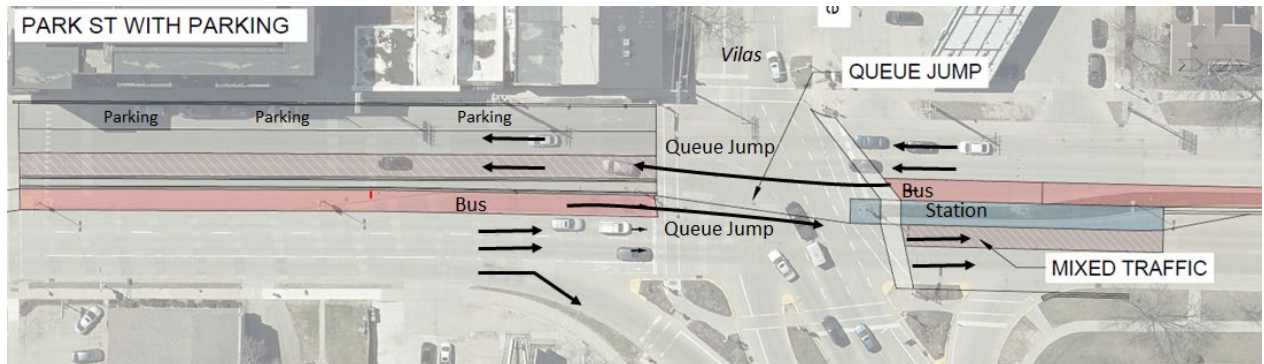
Parking Maintained Concept - West Washington Intersection
